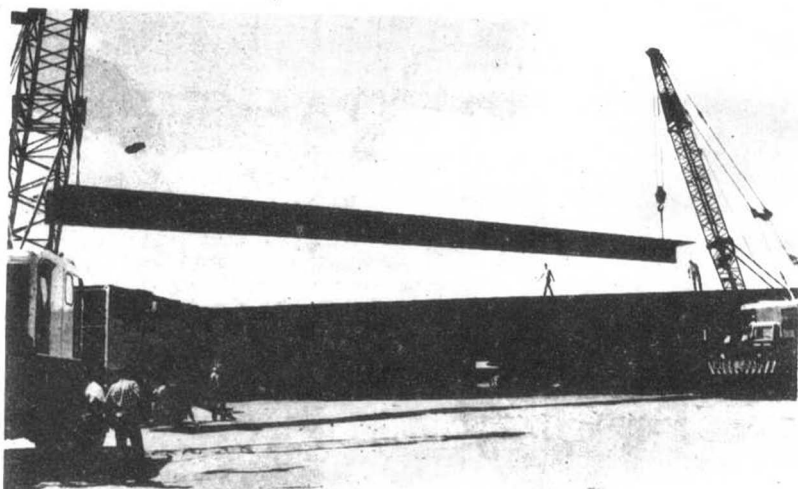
Erection of long-span precast tee section. Shipment from plant to site for these standard cross sections is usually by truck. Beams are picked from the truck and placed in the structure.
